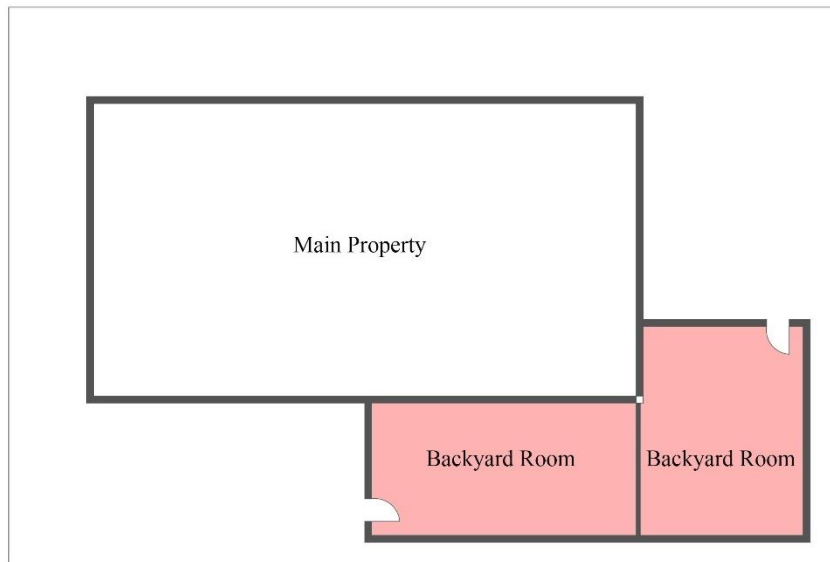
Image showing an example housing plan of an extension backyard dwelling. Source: Author, 2019
